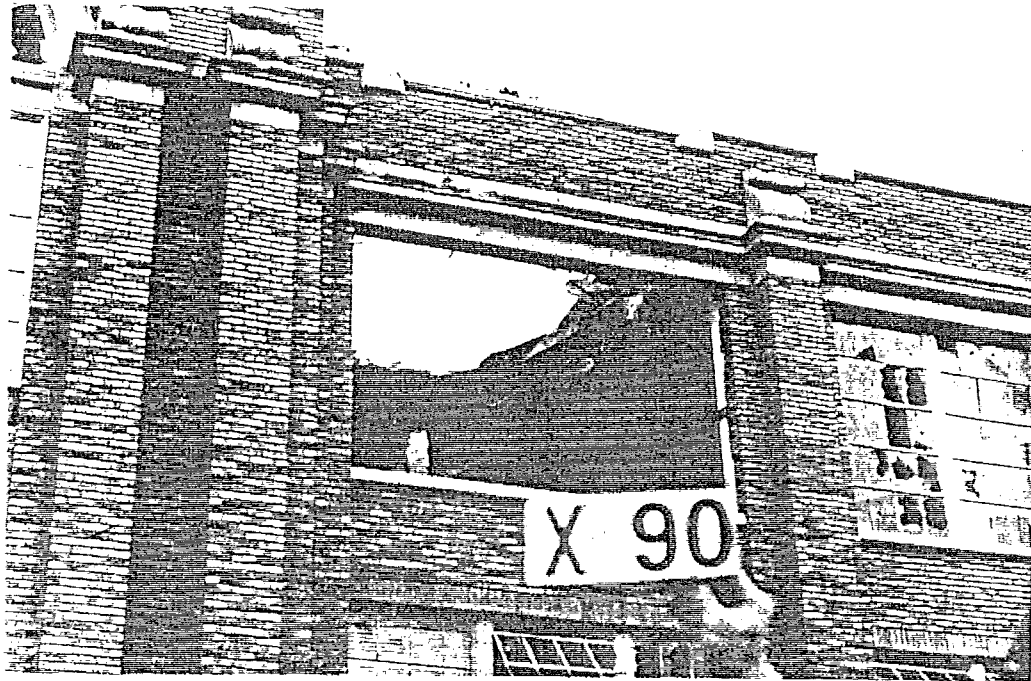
CENTRAL JUNIOR HIGH SCHOOL, ROOF SLAB. The slab collapsed under the weight of brick masonry parapet and cast stone coping material.
